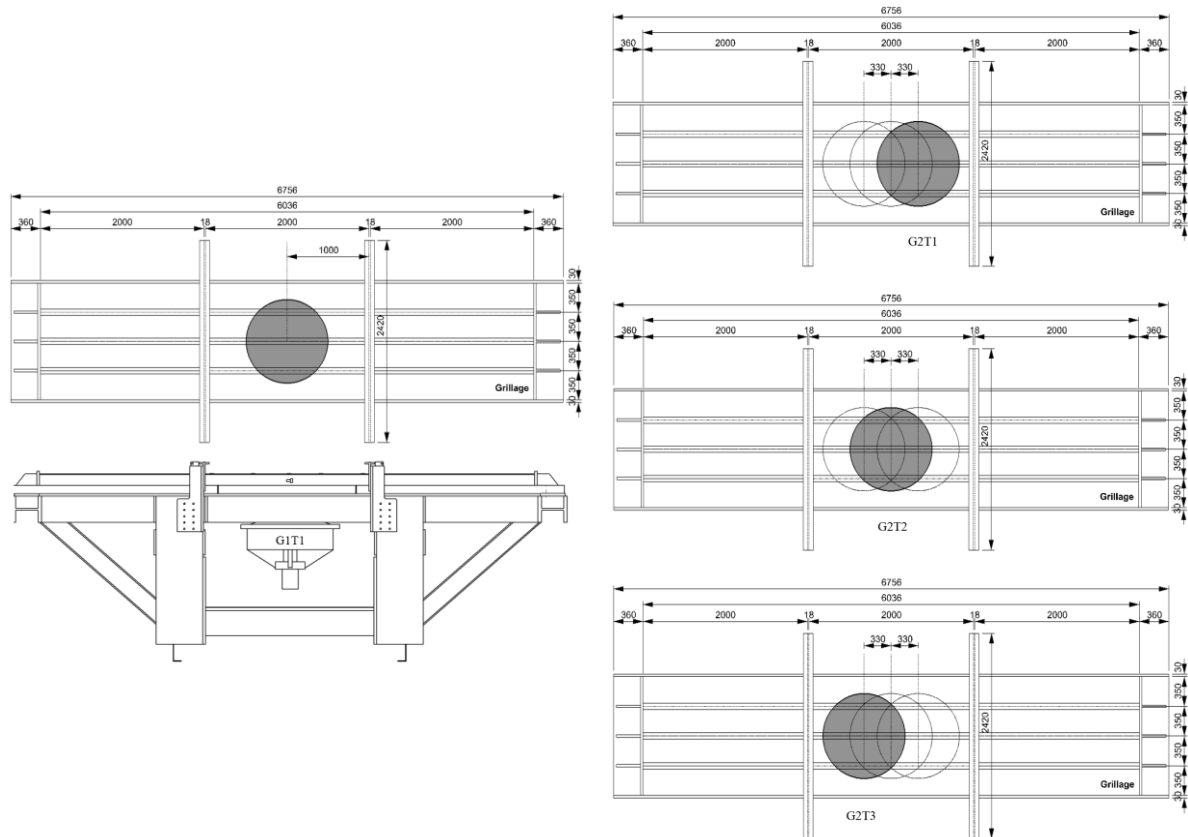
The loading setup of Grillage #1(left) and Grillage #2(right)
